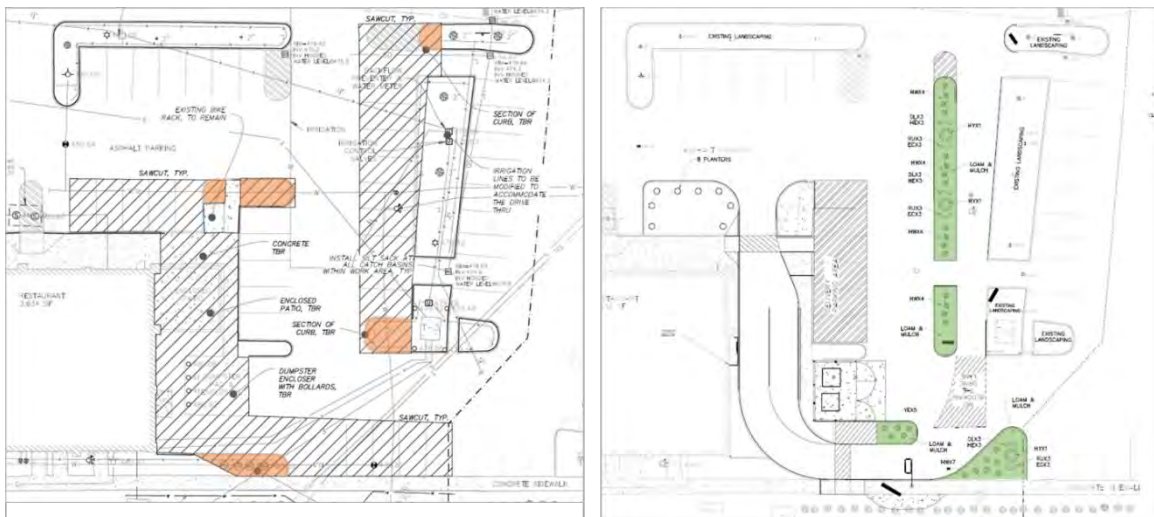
Excerpts from the proposed Demolition Plan (left) and proposed Landscaping Plan (right) that show the landscaping areas that are proposed to be removed in orange, and the landscaping areas that are proposed to be added in green.
